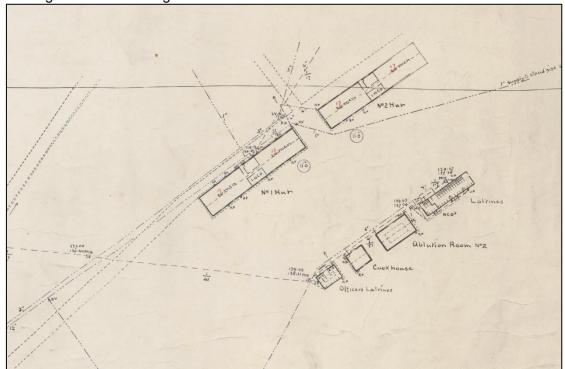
section of 1907 GHF Skeleton plan showing buildings to north of Fort
